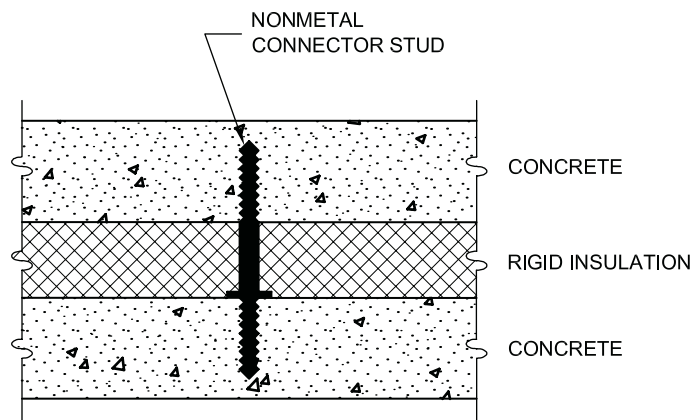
Insulated tilt-up panels use a low heat conducting tie to hold the two concrete panels together and to allow them to act as one structurally.
